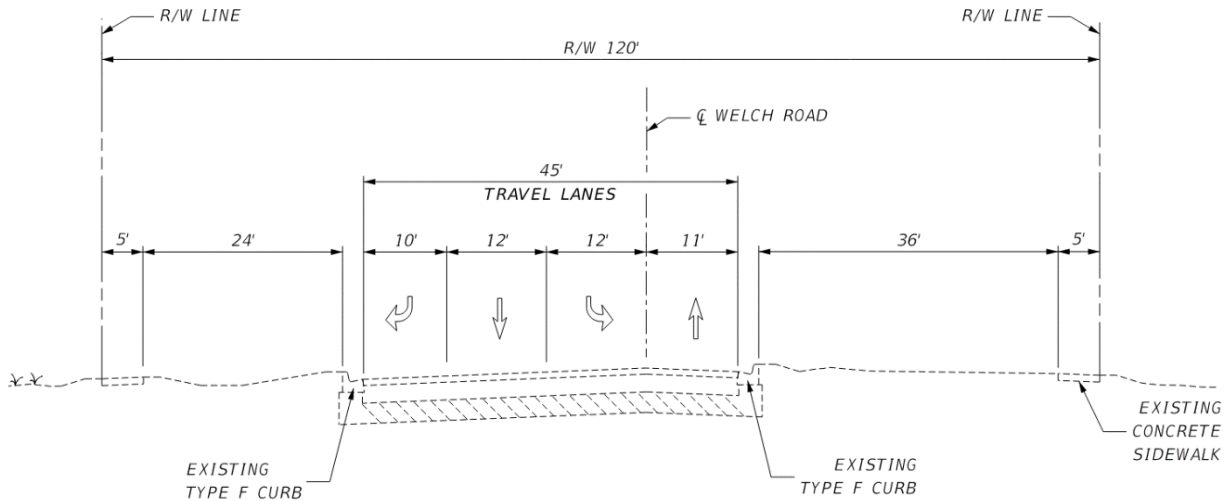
| Existing Typical Section – Welch Road from 1150 feet west of Rock Springs Road to 400 feet west of Rock Springs Road
